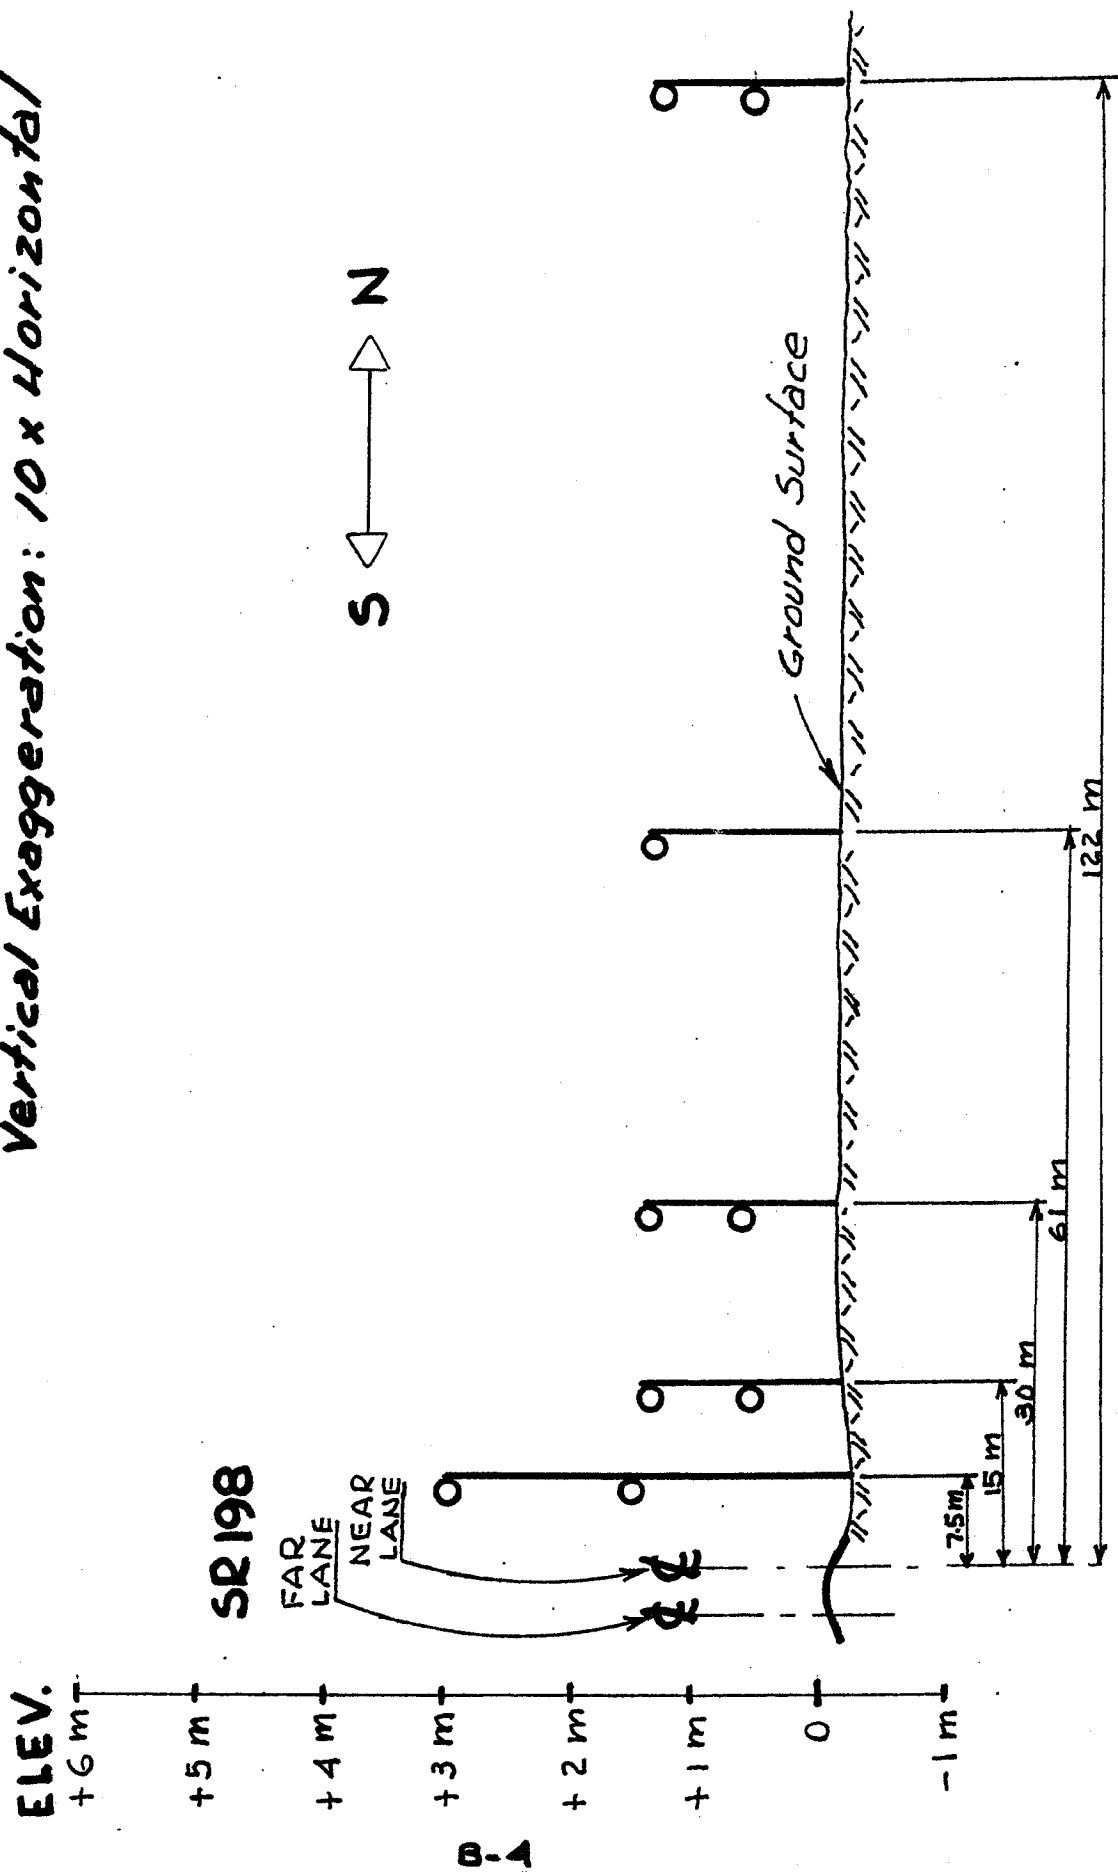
Cross Section of Site G-4 "AVENUE 7"
